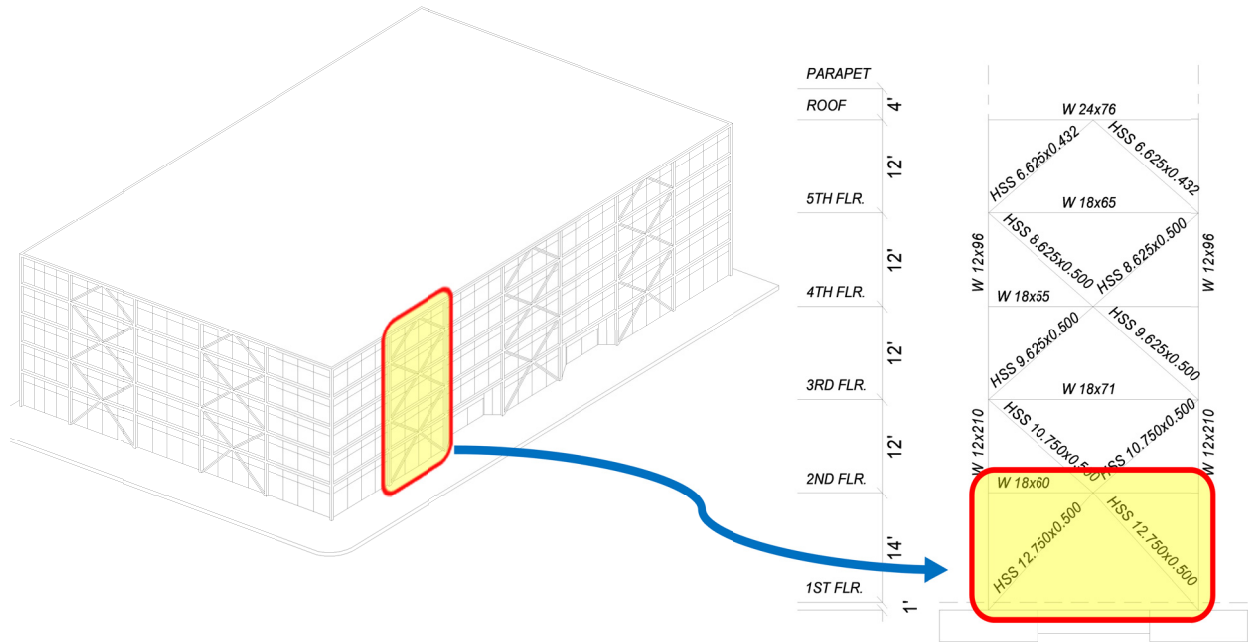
Prototype typical X-bracing geometry and illustration of the chevron braced frame consideration for determining reduced-scale specimens design forces.
